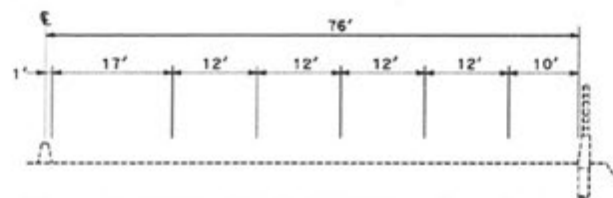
Existing I-10 Half-Width Section with Soundwalls
